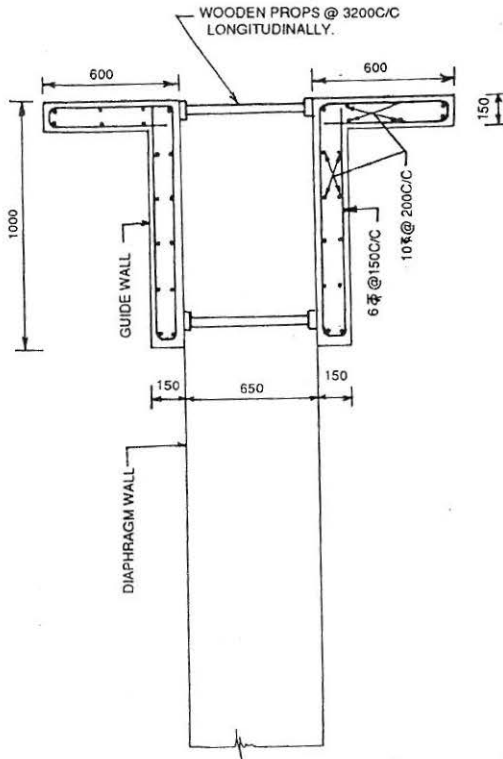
Guide Wall for Diaphragm Wall Trench
